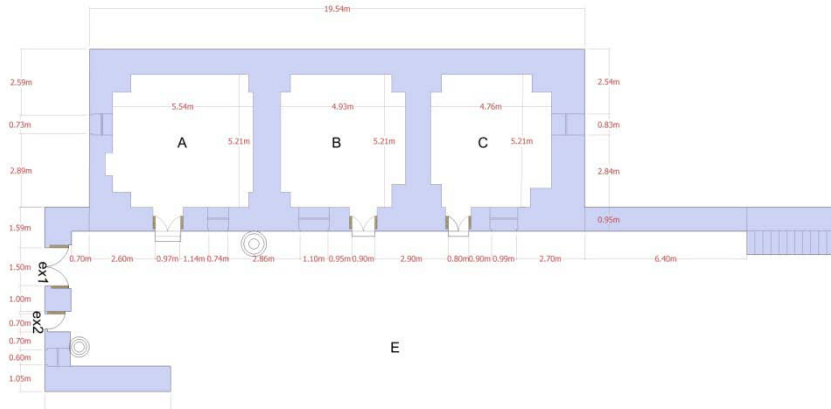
A top plan model of cross and keyed vaults (Eidoun)
